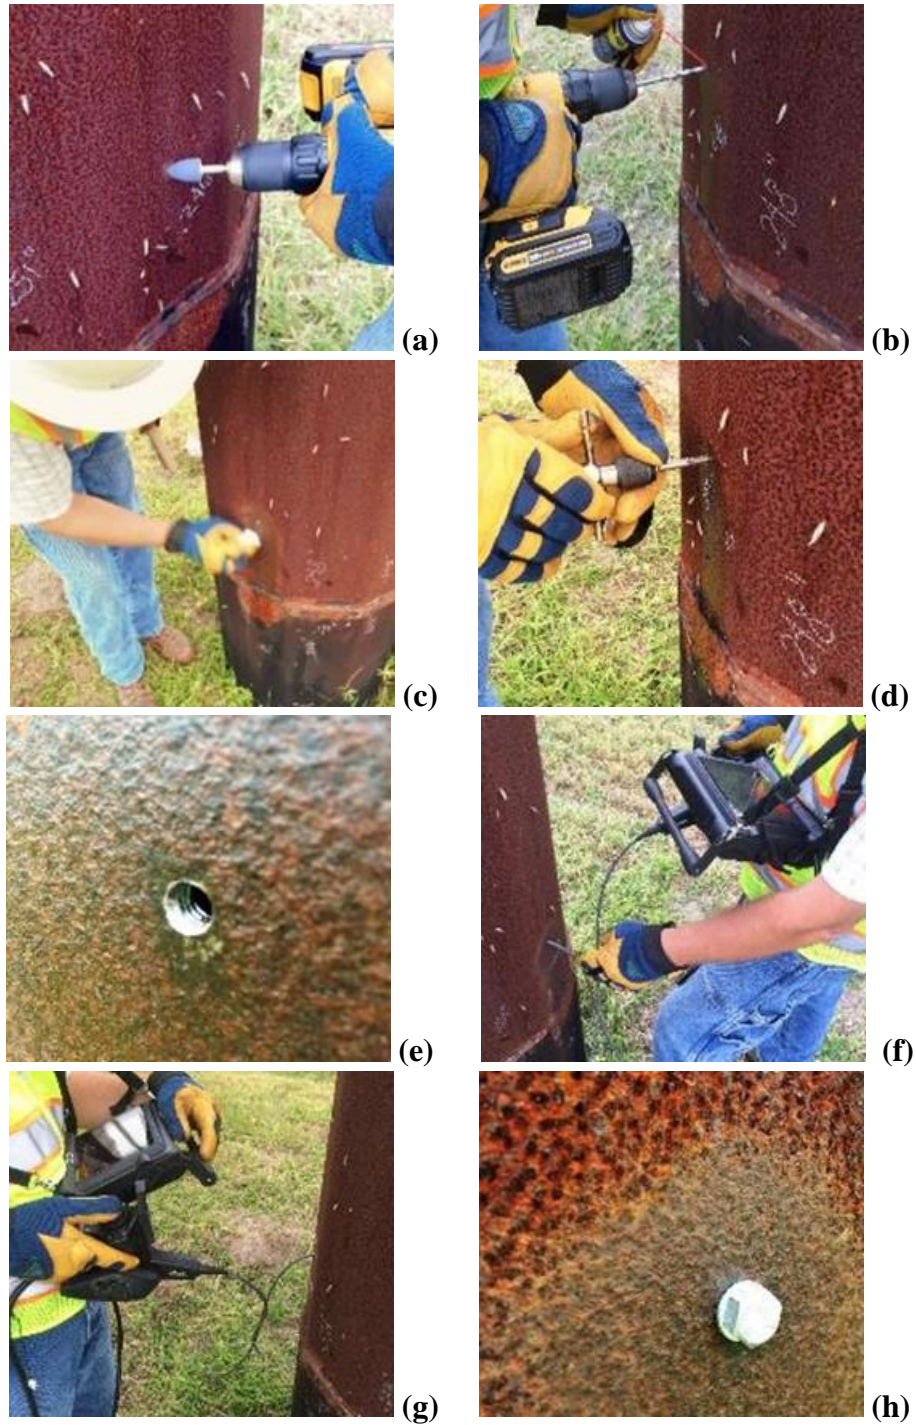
Interior inspection of Pole TL-1 at Site 4 via borescope: (a) grinding pole wall; (b) drilling; (c) cleaning surface; (d) threading hole; (e) close-up image of hole; (f) inserting borescope camera; (g) examining pole interior; and (h) plugging hole after inspection.
